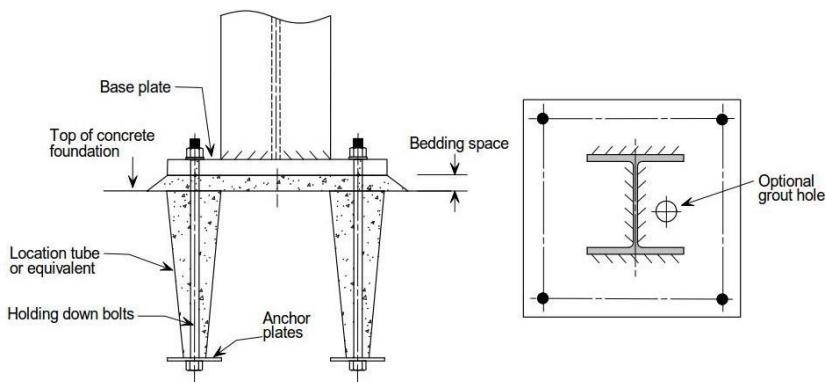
Figure showing the plan view of a typical column base connection. Retrieved from “Joints in Steel Construction – Simple Joints to Eurocode 3” by The Steel Construction Institute (p. 237), 2014.
